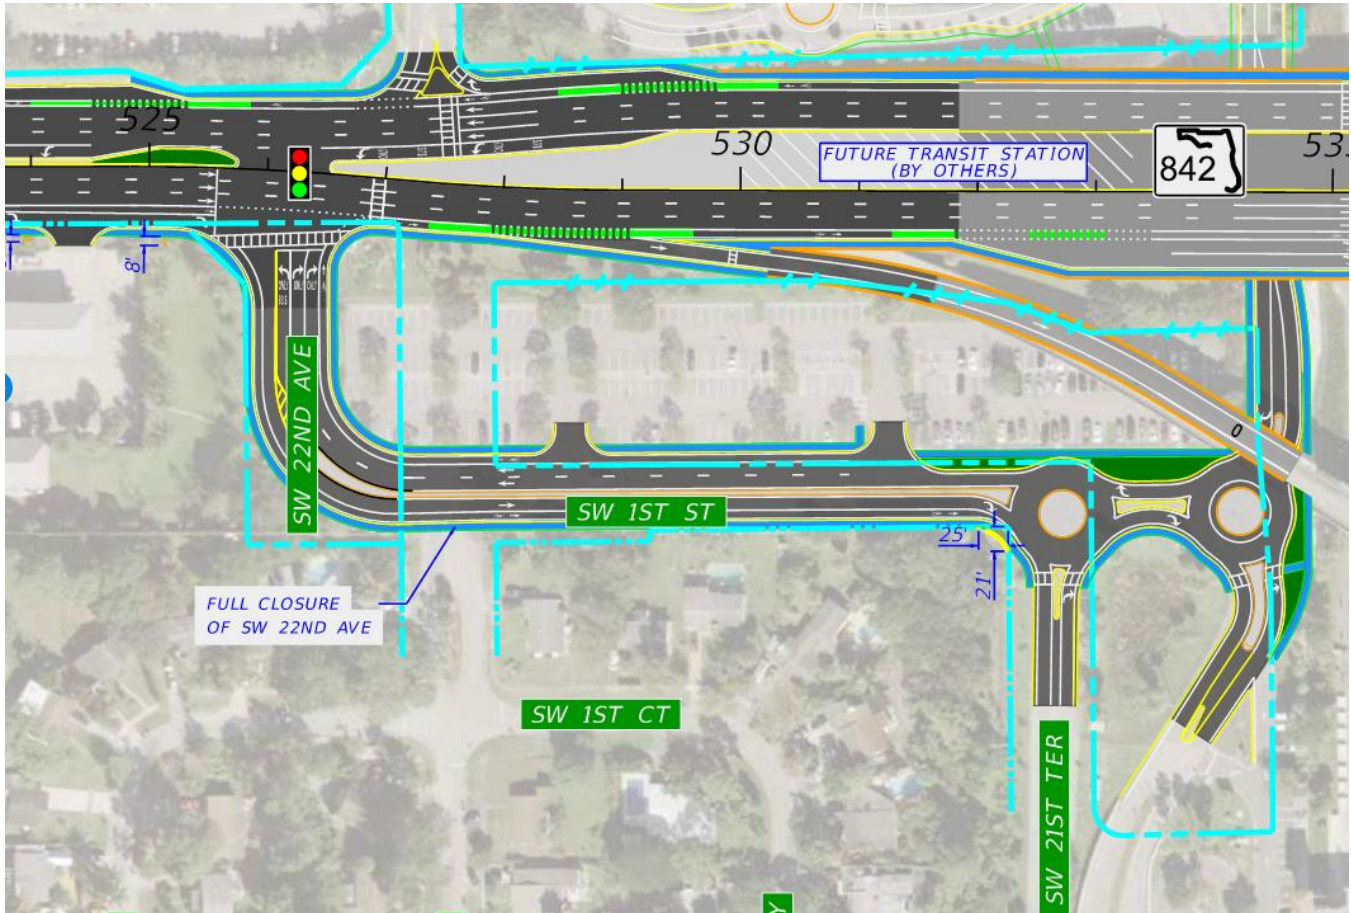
| SW 1<sup>st</sup> Street Alternative 2 – T-Intersection and Roundabout
